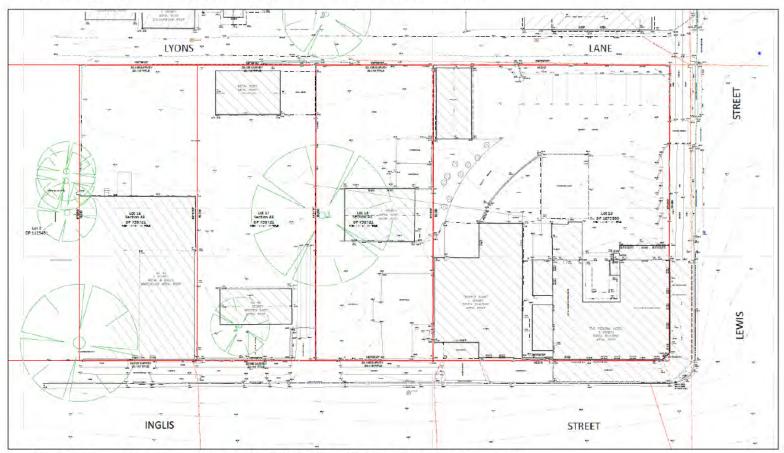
Survey Plan of the subject site - 34-42 Inglis Street, Mudgee. (Source: VMark Survey Pty Ltd)
